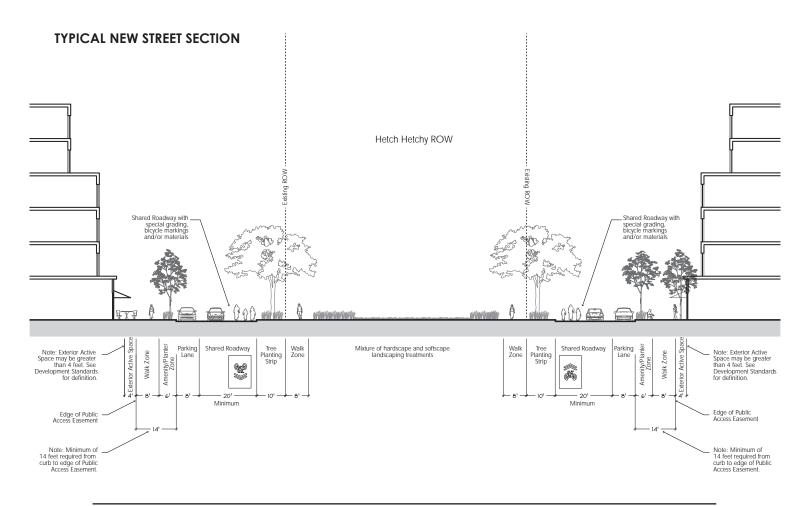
Hetch Hetchy Greenway Section (E-E)
